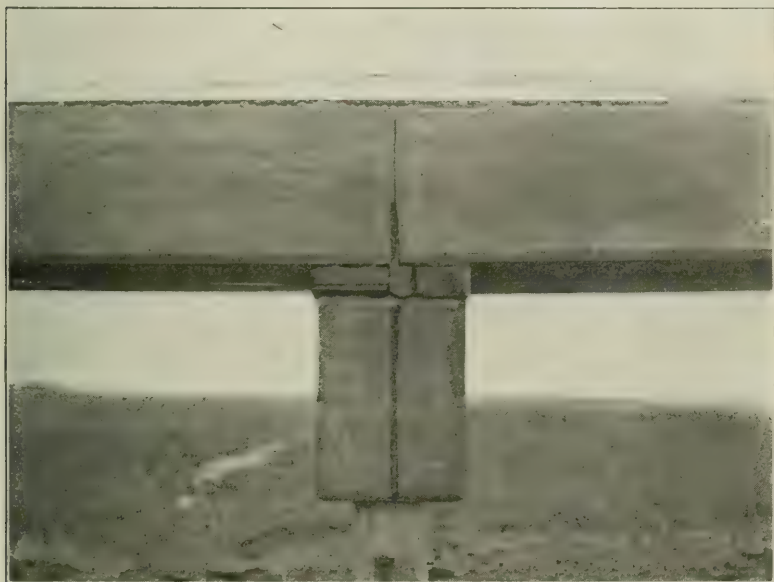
Concrete Girder, Leveled Up After Settlement.
